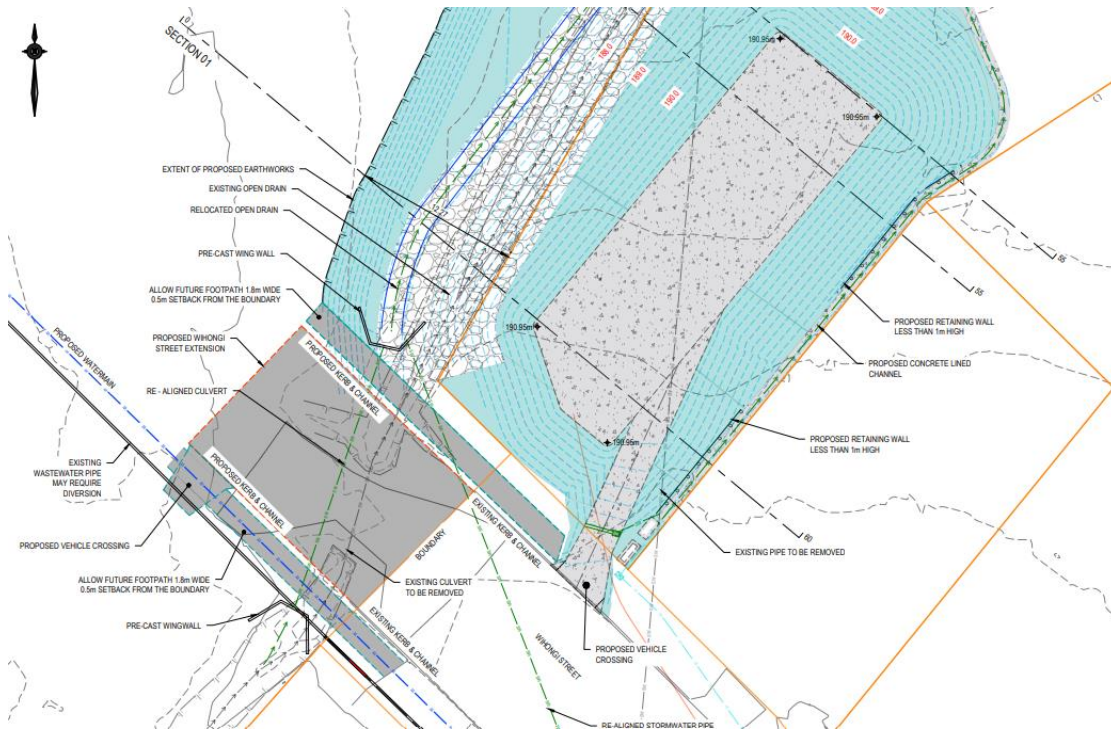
Haigh Workman Site Plan of proposed works (see Appendix A).
